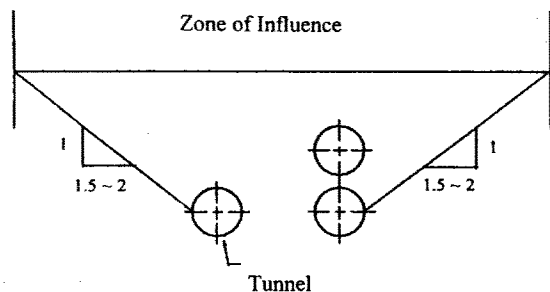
Zone of Influence for Tunnelling, TRTS Project
